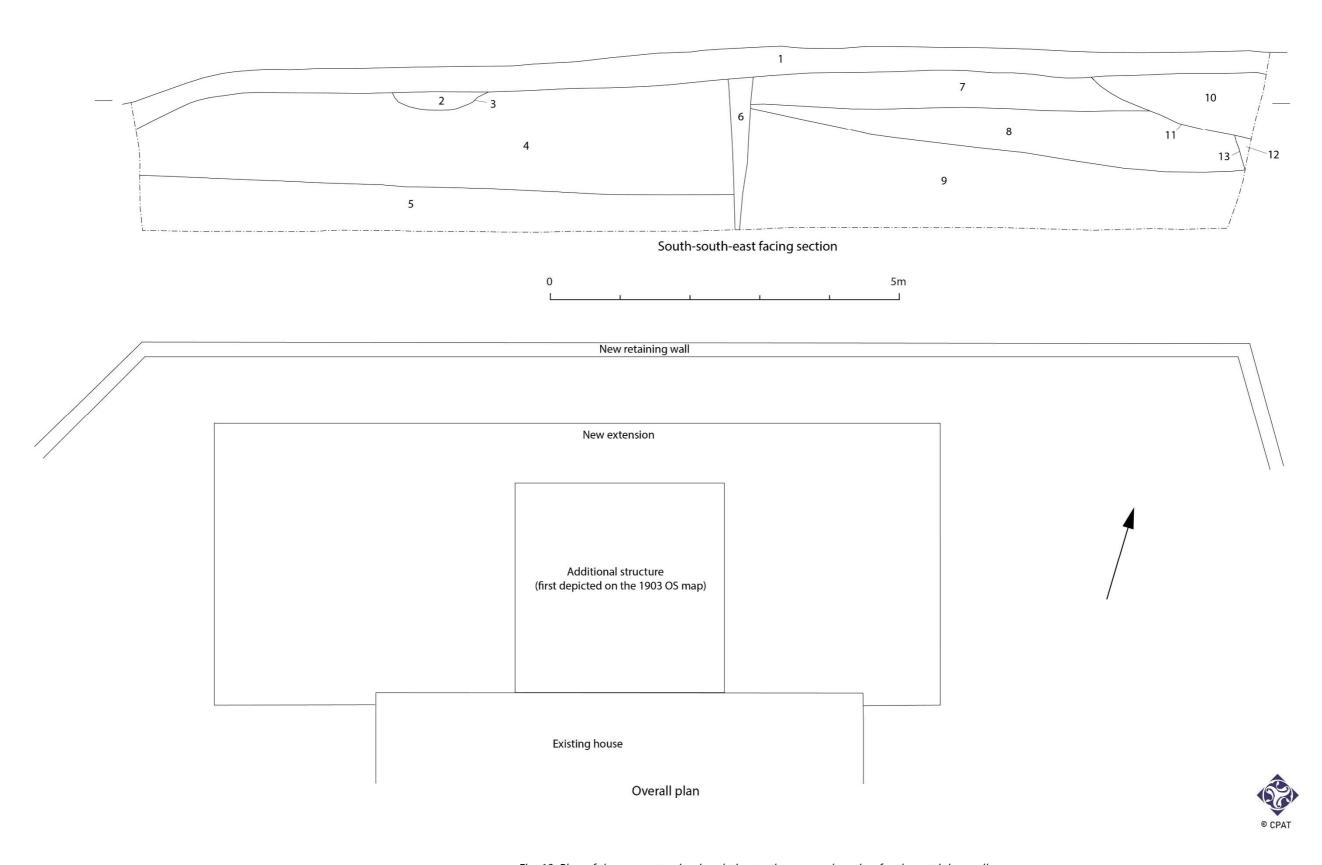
Plan of the new extension in relation to the exposed section for the retaining wall
